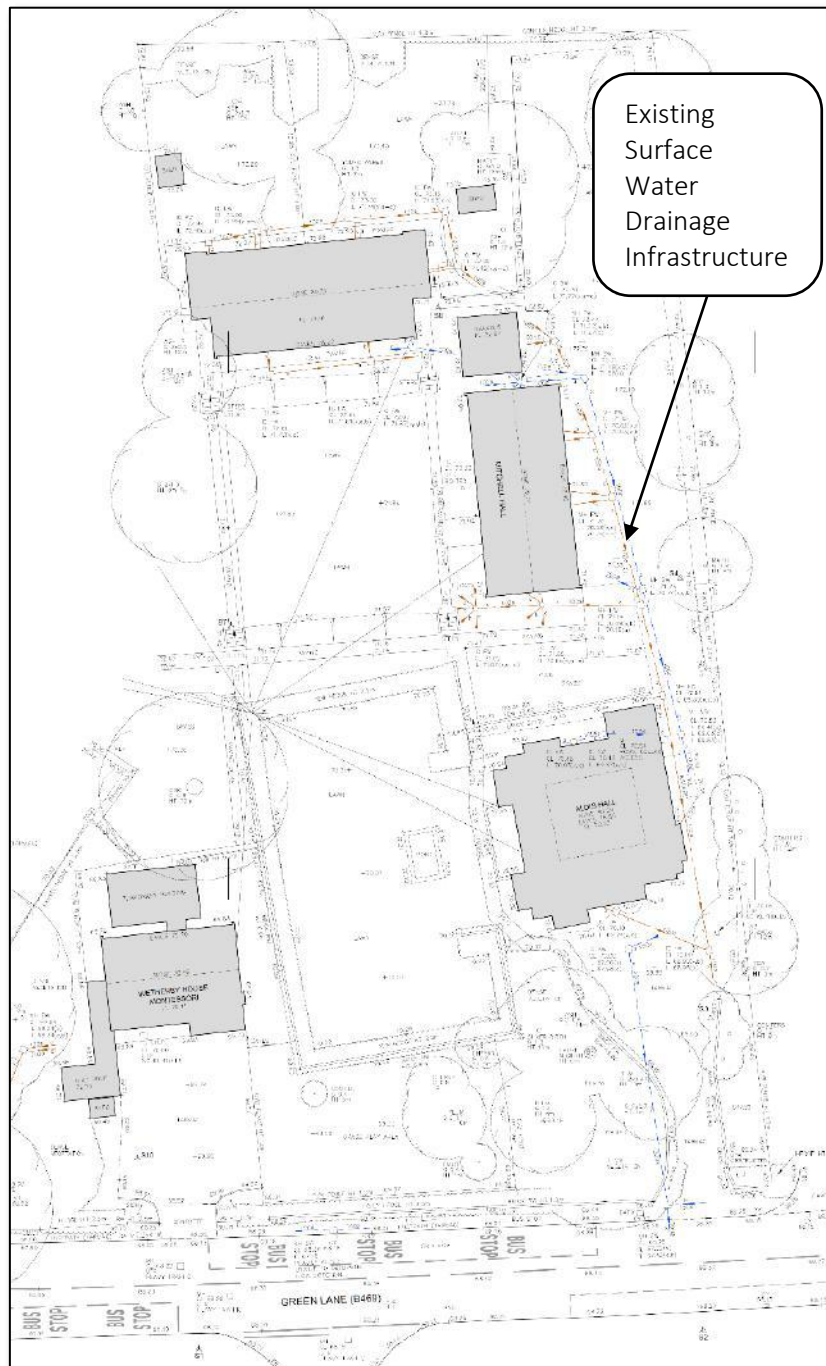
Extract of Appendix 1, Plan 3 – Topographical Survey of the Site.
